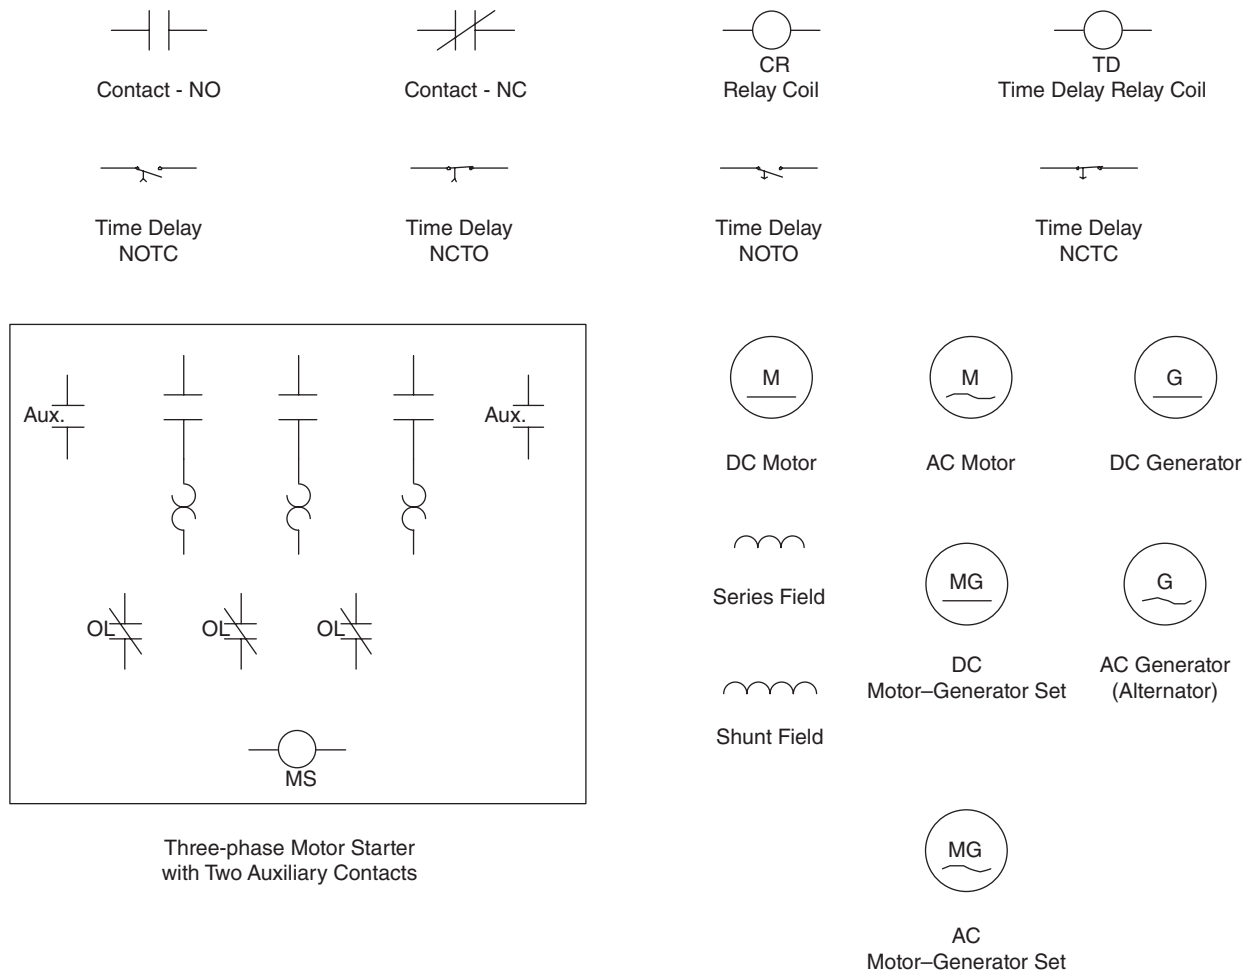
Contact, relay, motor starter, motor, and generator symbols.
